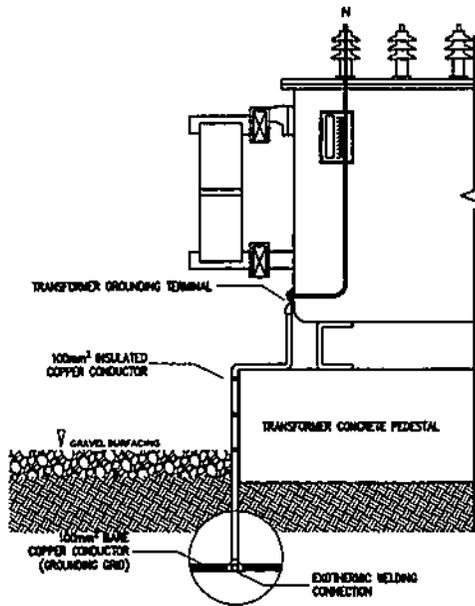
DETAILS OF EXOTHERMIC WELDING CONNECTION
